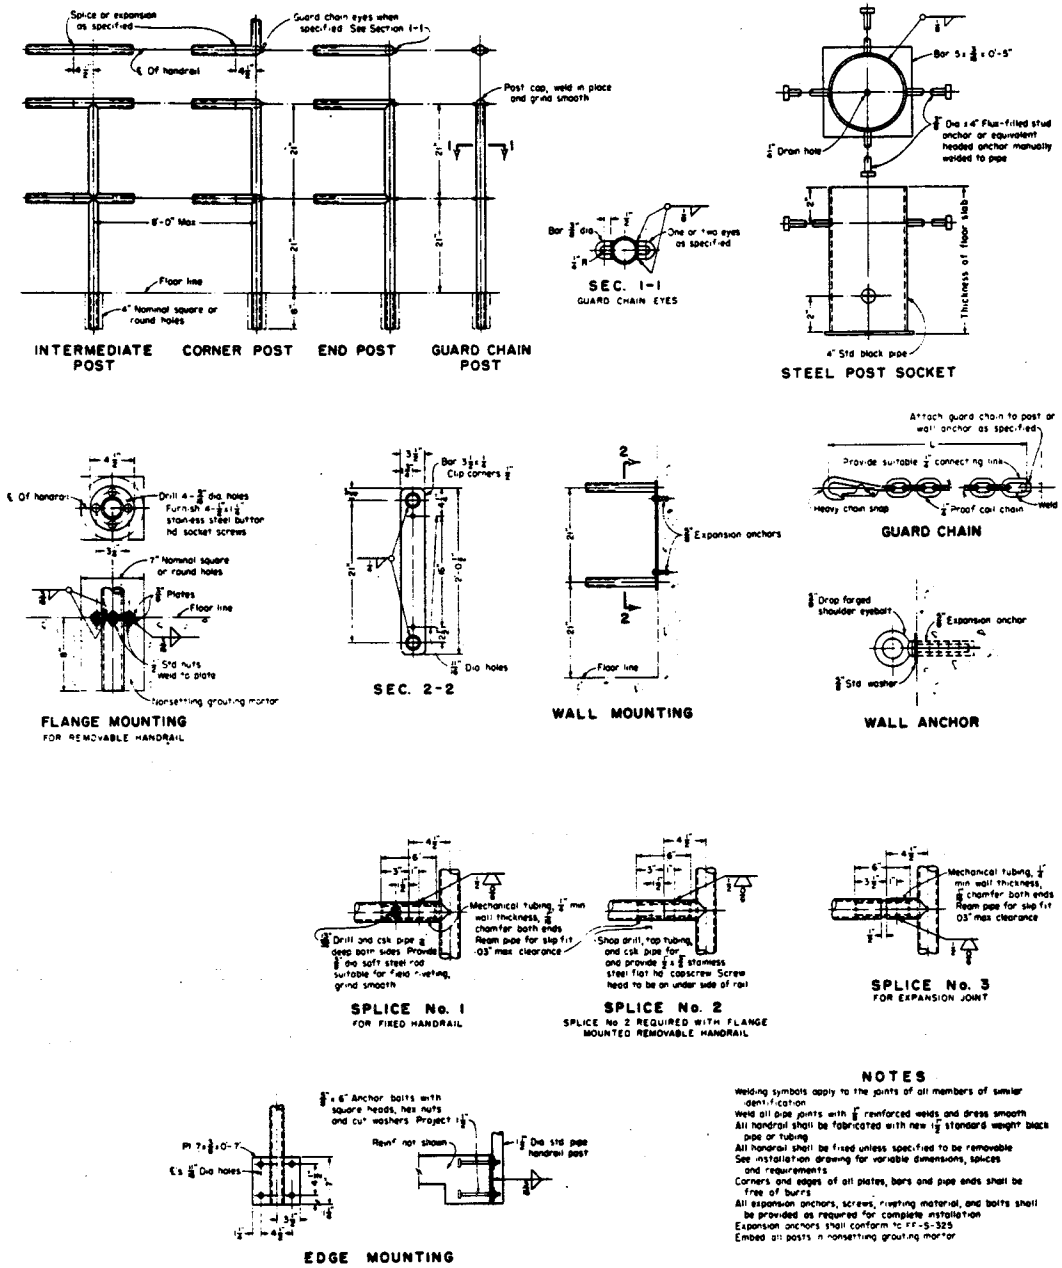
Two-rail handrail—42 inches high. 103-D-1202
